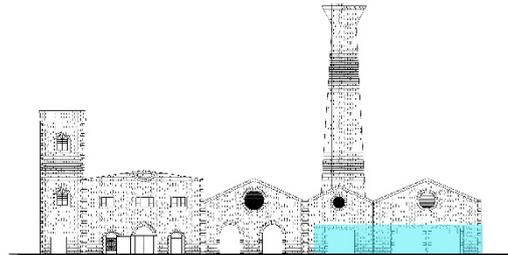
Later Addition - openings, south-east facade, Barrack C and D, 15 to 17A, East Wharf, KPT, Karachi.
